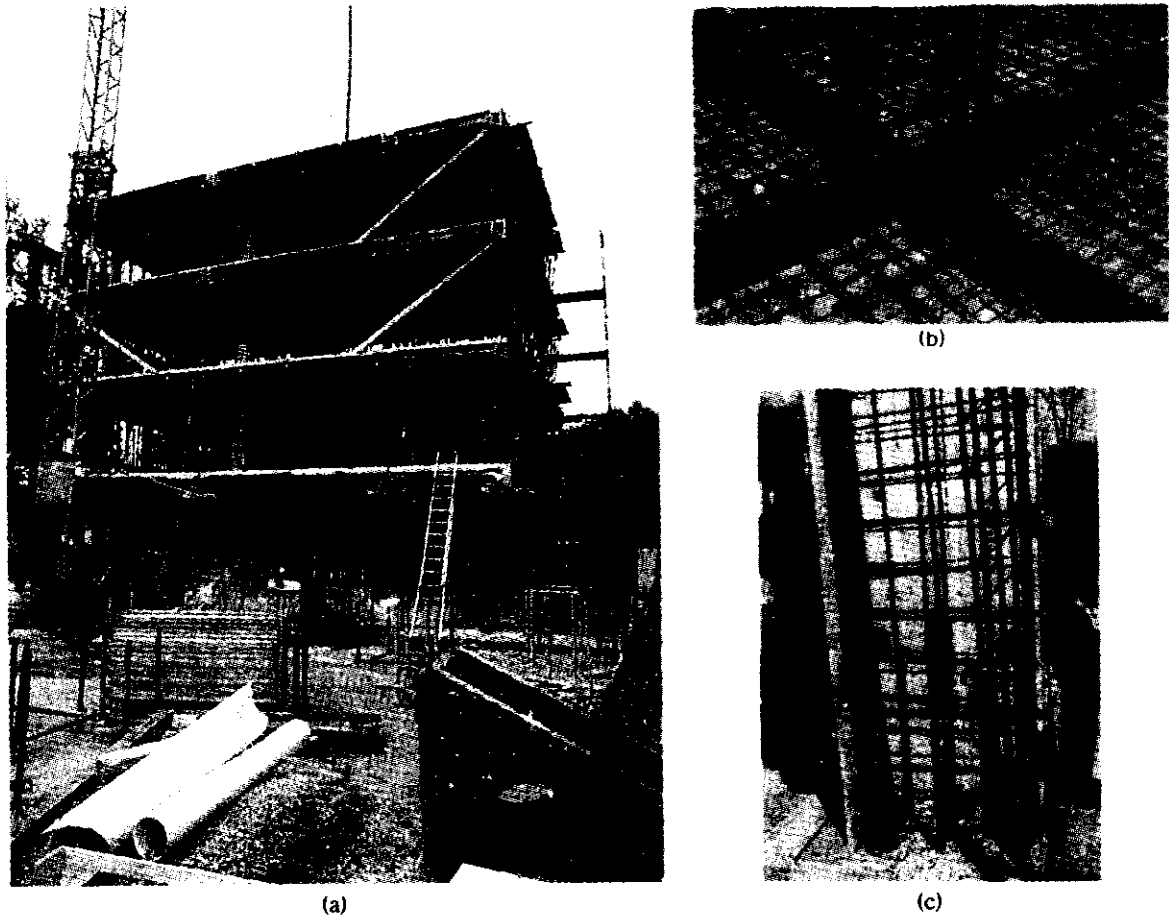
Construction of models: (a) general view (b) interior joint (c) lap-splicing detail
